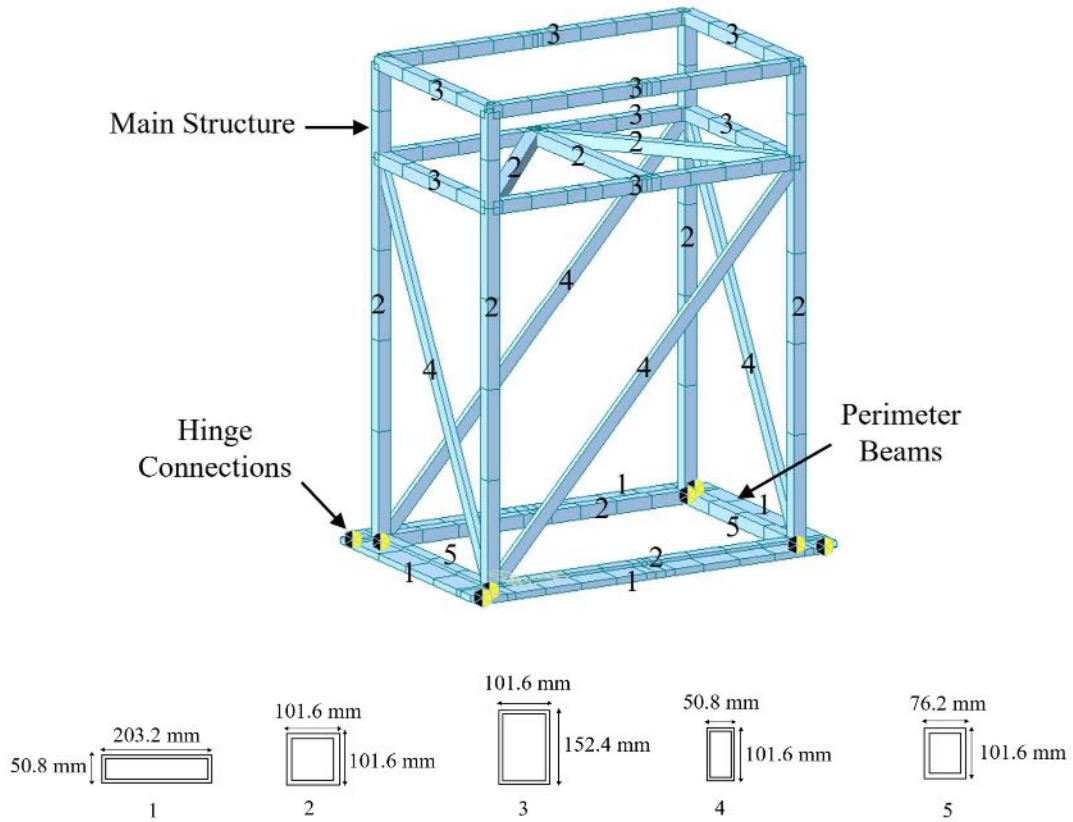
FE model of the supporting steel structure with its bolted connections to the turntable, framing layout, and the cross sections of the five framing profiles.
